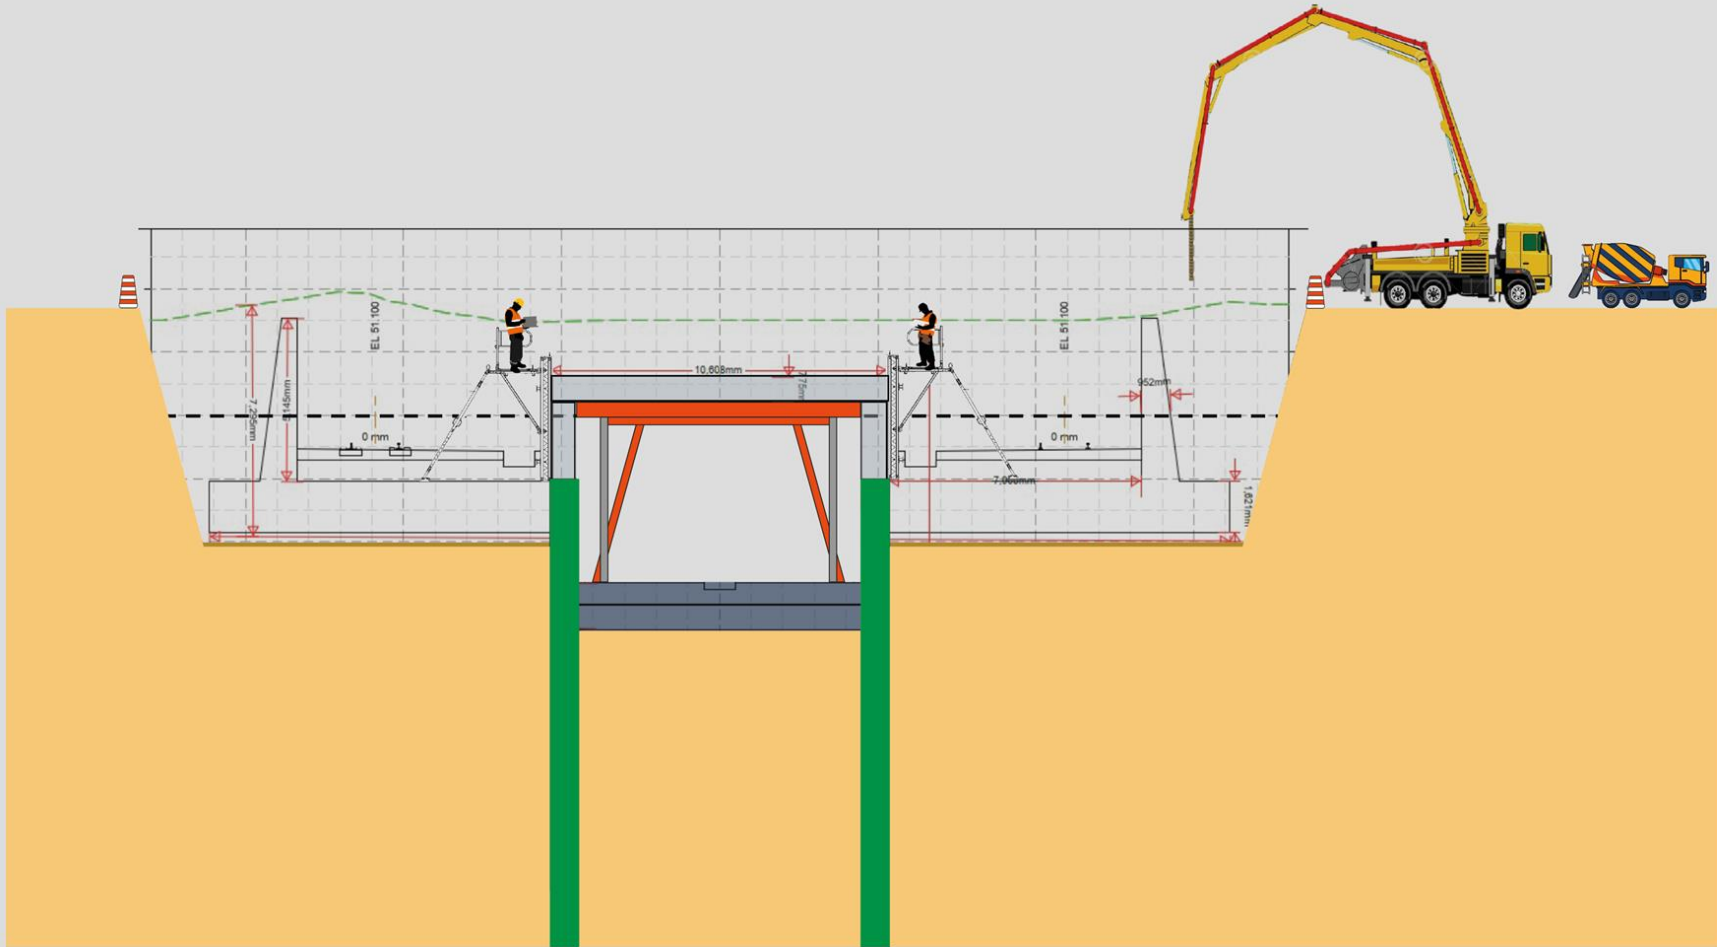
Dardistown Station - 4 Track U Section Construction Sequencing
